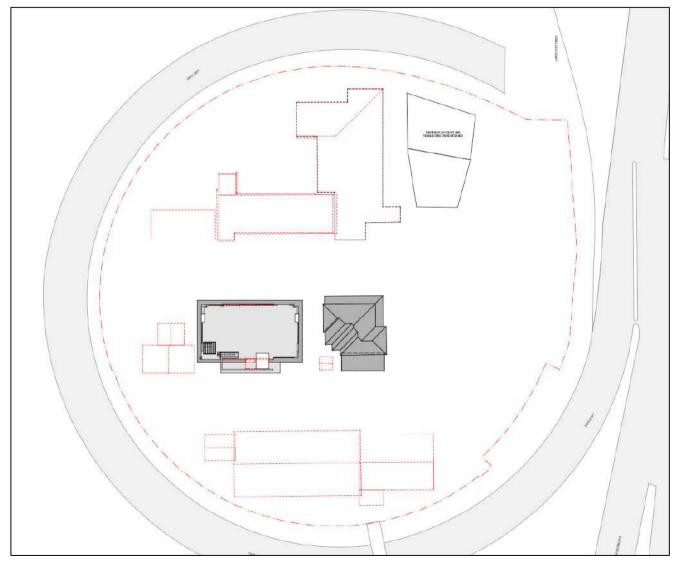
Demolition Plan – Roof (Source: FJMT Studio, DWG DA-2104, 18.12.2019)
